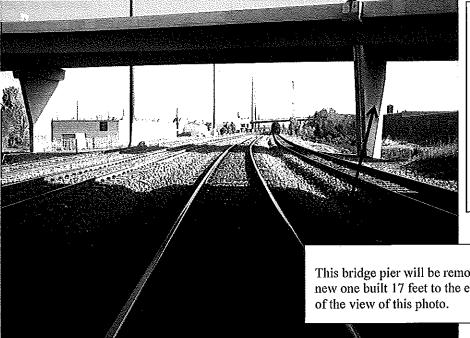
; Current bridge (F-16-EJ) over the BNSF that will be replaced. From left to right, the historic railroad lines are Denver, South Park & Pacific (5DV6243), Denver & New Orleans (5DV9105), and Atchison, Topeka, Santa Fe (5DV.4783). The fourth track on the far right side is a small section of siding. View is to north.
